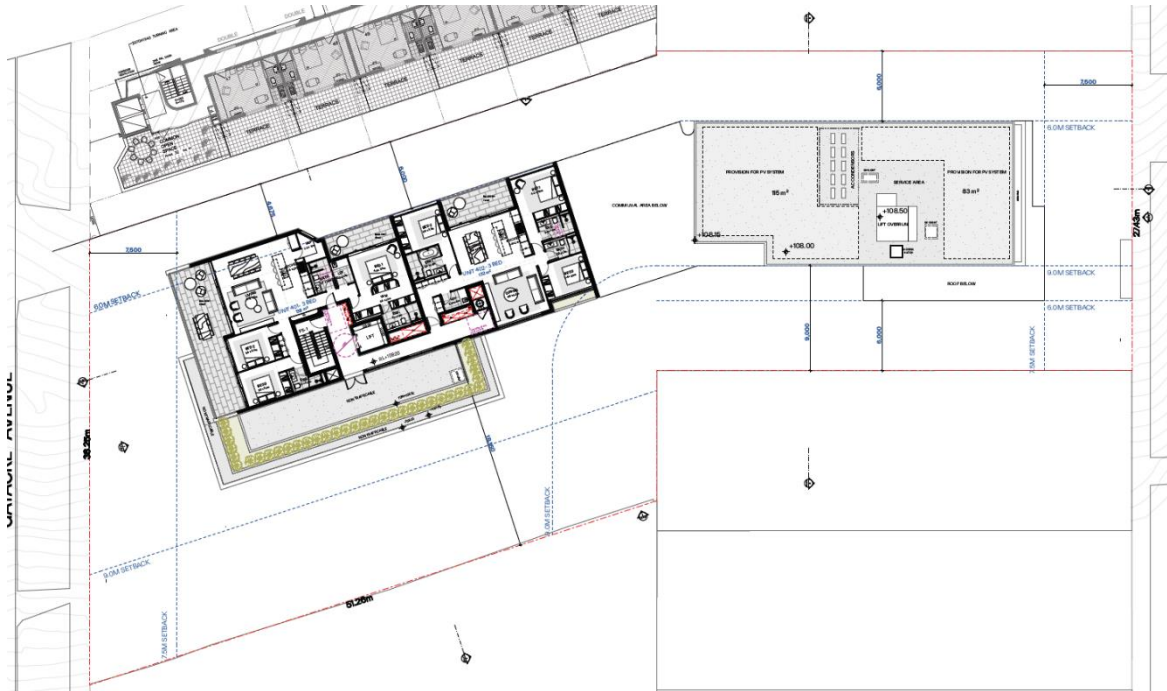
Level 4 Floor Plan showing Sixth Storey Setbacks
